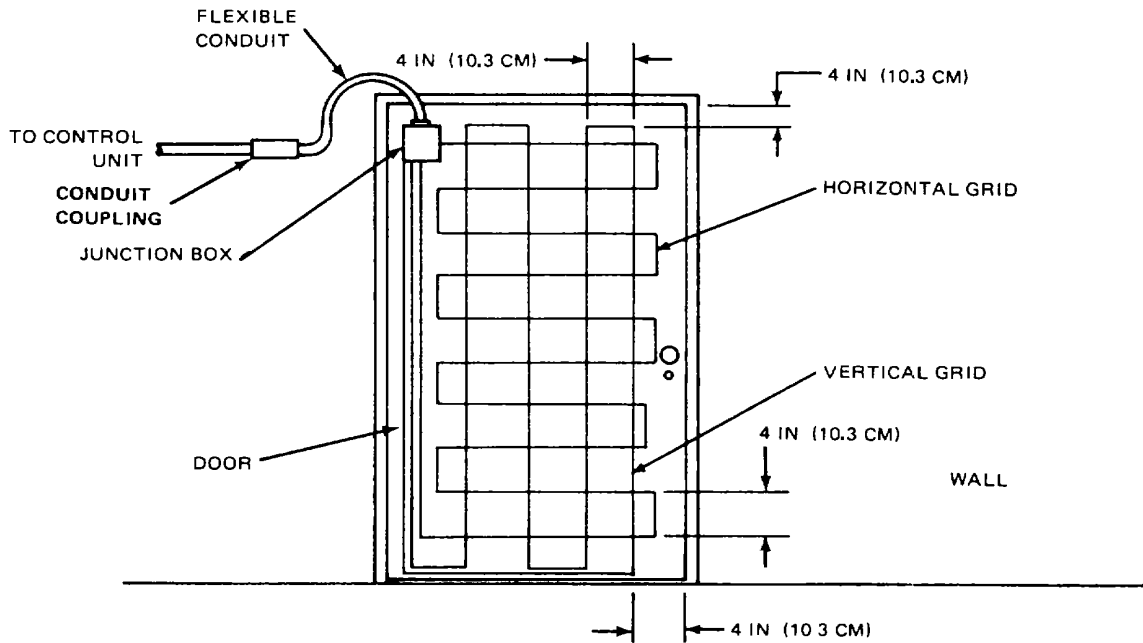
Alternate Wire Grid Installation on Wooden Door
